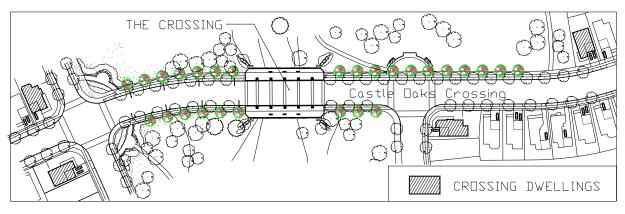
Location Plan Showing Crossing Dwellings
